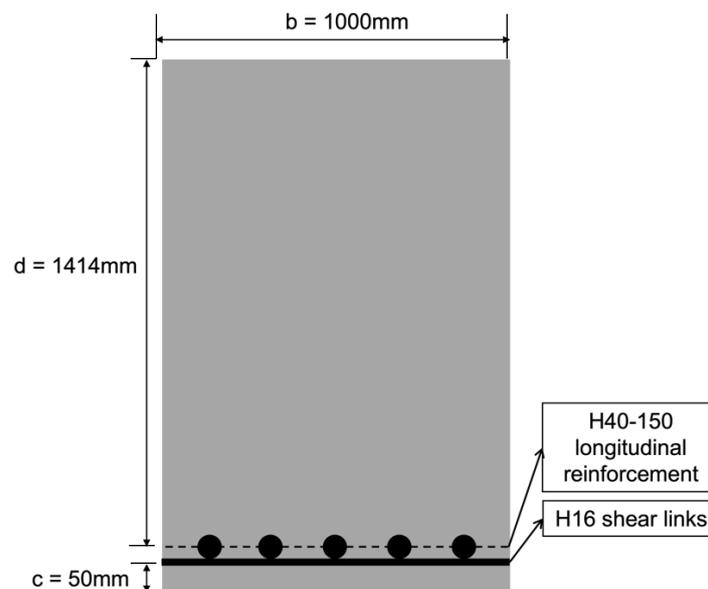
Design section from the base slab of an underground tunnel
